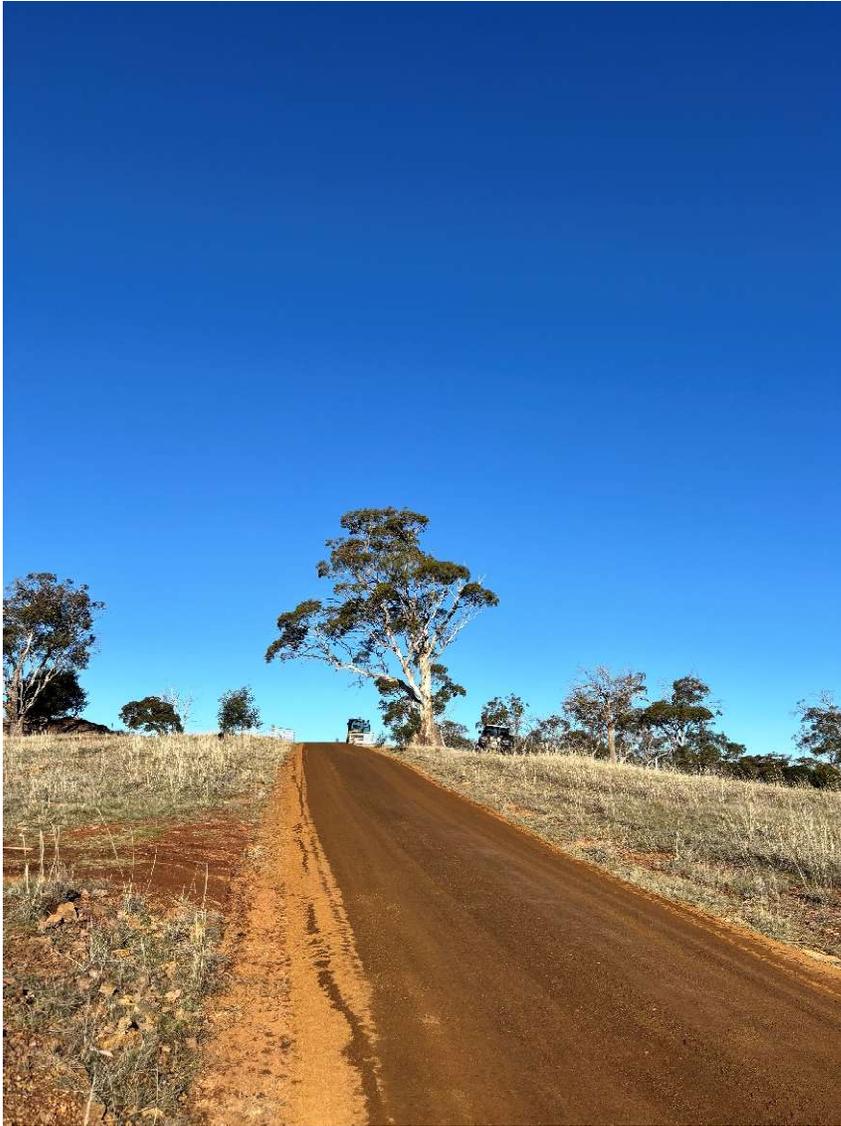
Professionally installed all weather compacted gravel access driveway from Prossers Road to the proposed camping area, 4m wide with stormwater culverts.
